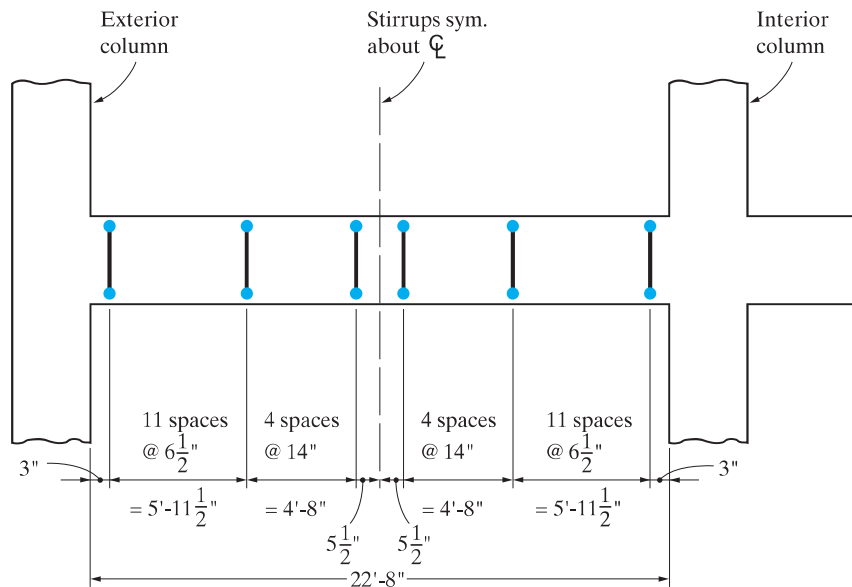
Stirrup spacing for Example 6-1 end span (interior spans similar).
